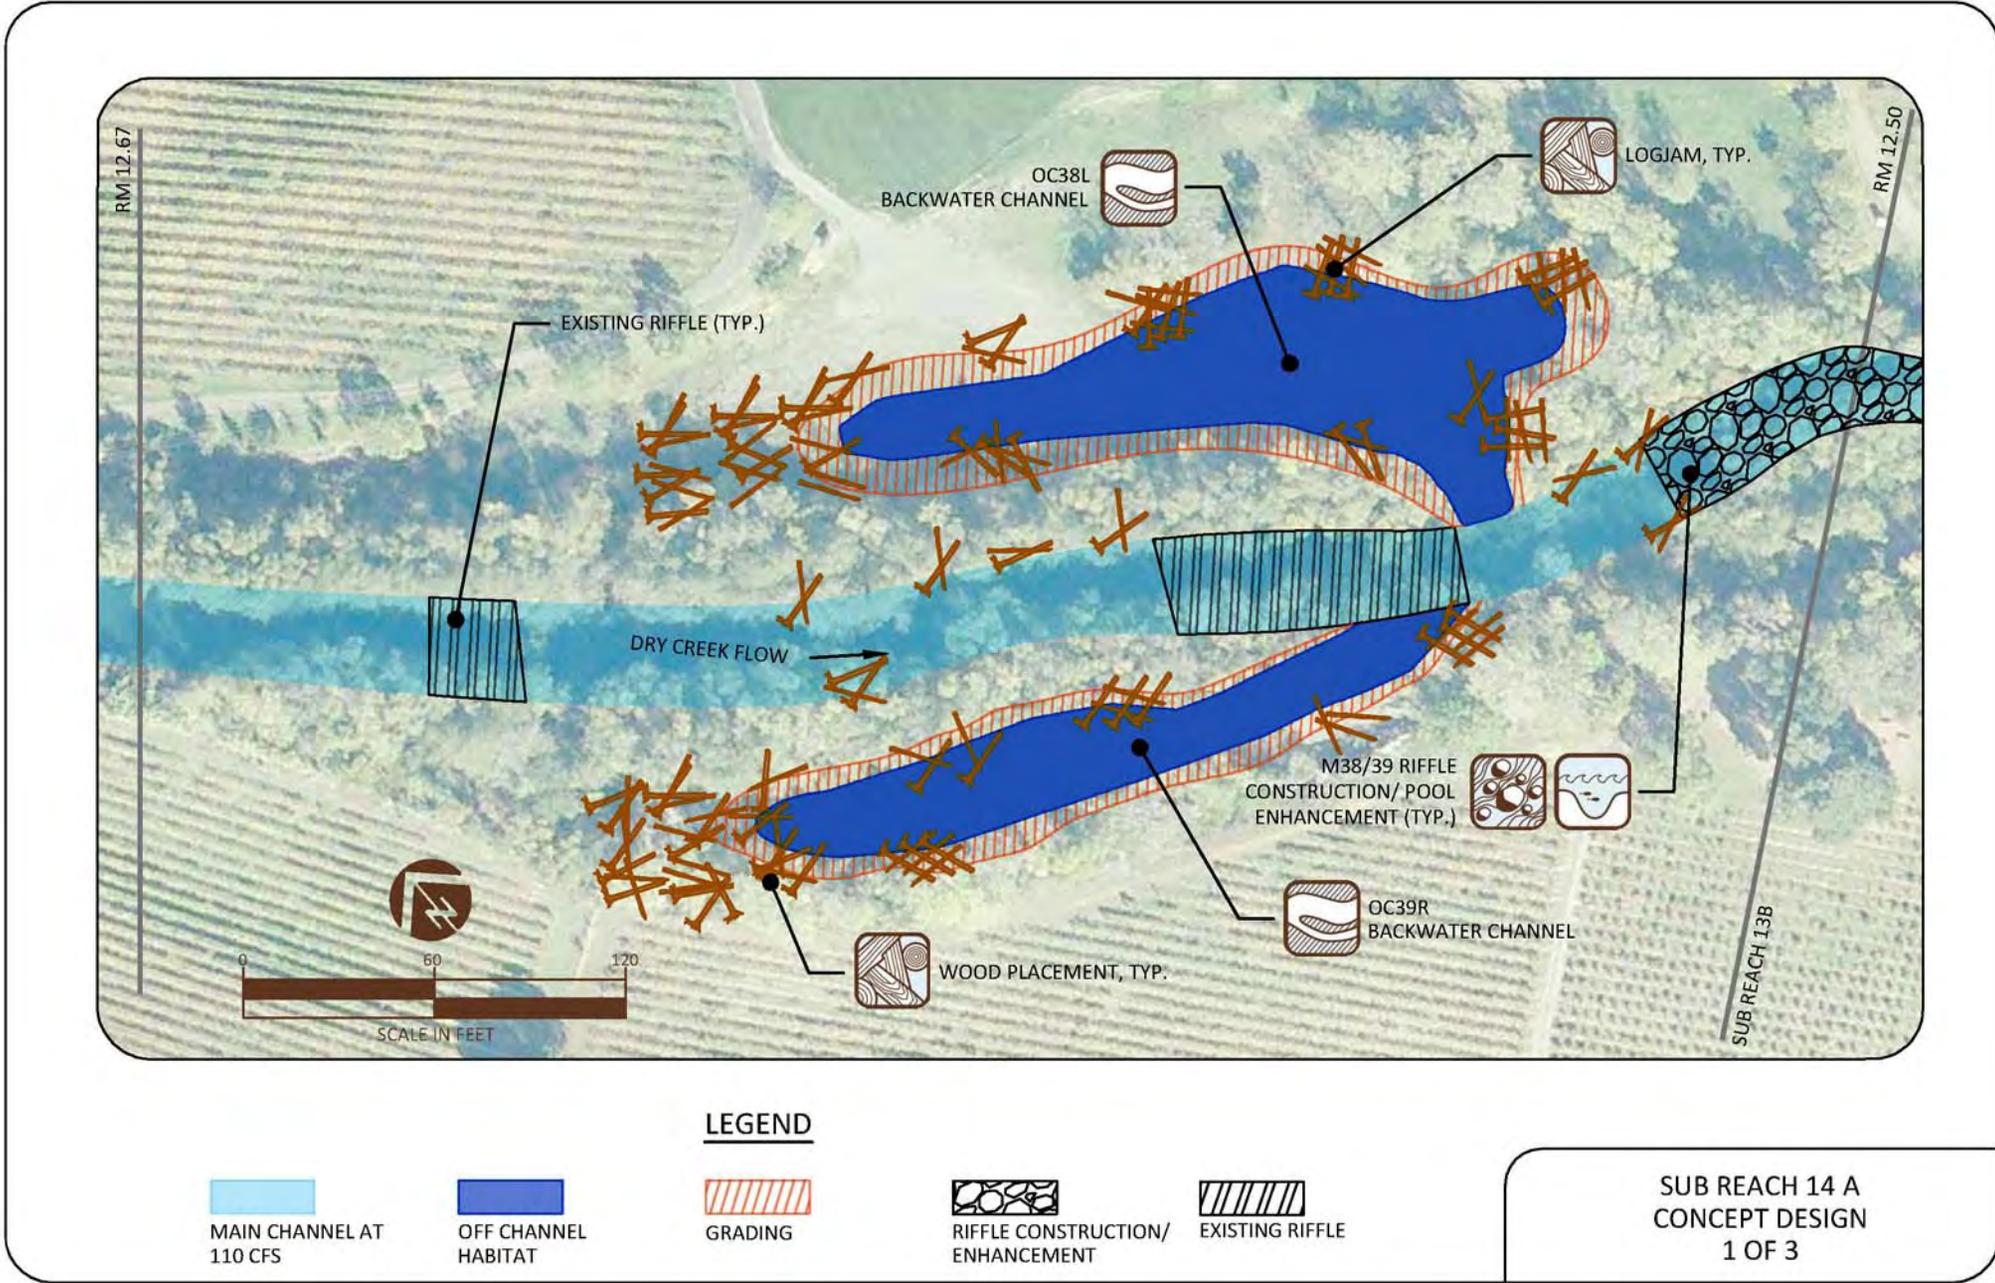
Sub-reach 14a conceptual design detail sheet 1 of 3.
